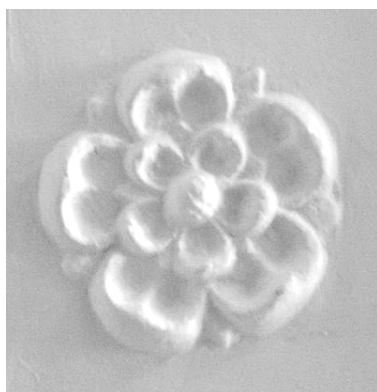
Surviving section of plasterwork ceiling over body of main hall.
